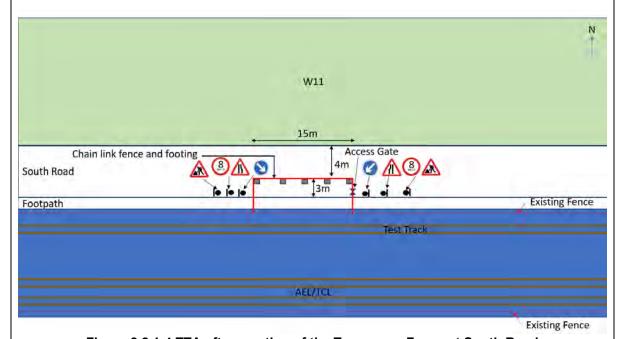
TTA after erection of the Temporary Fence at South Road
